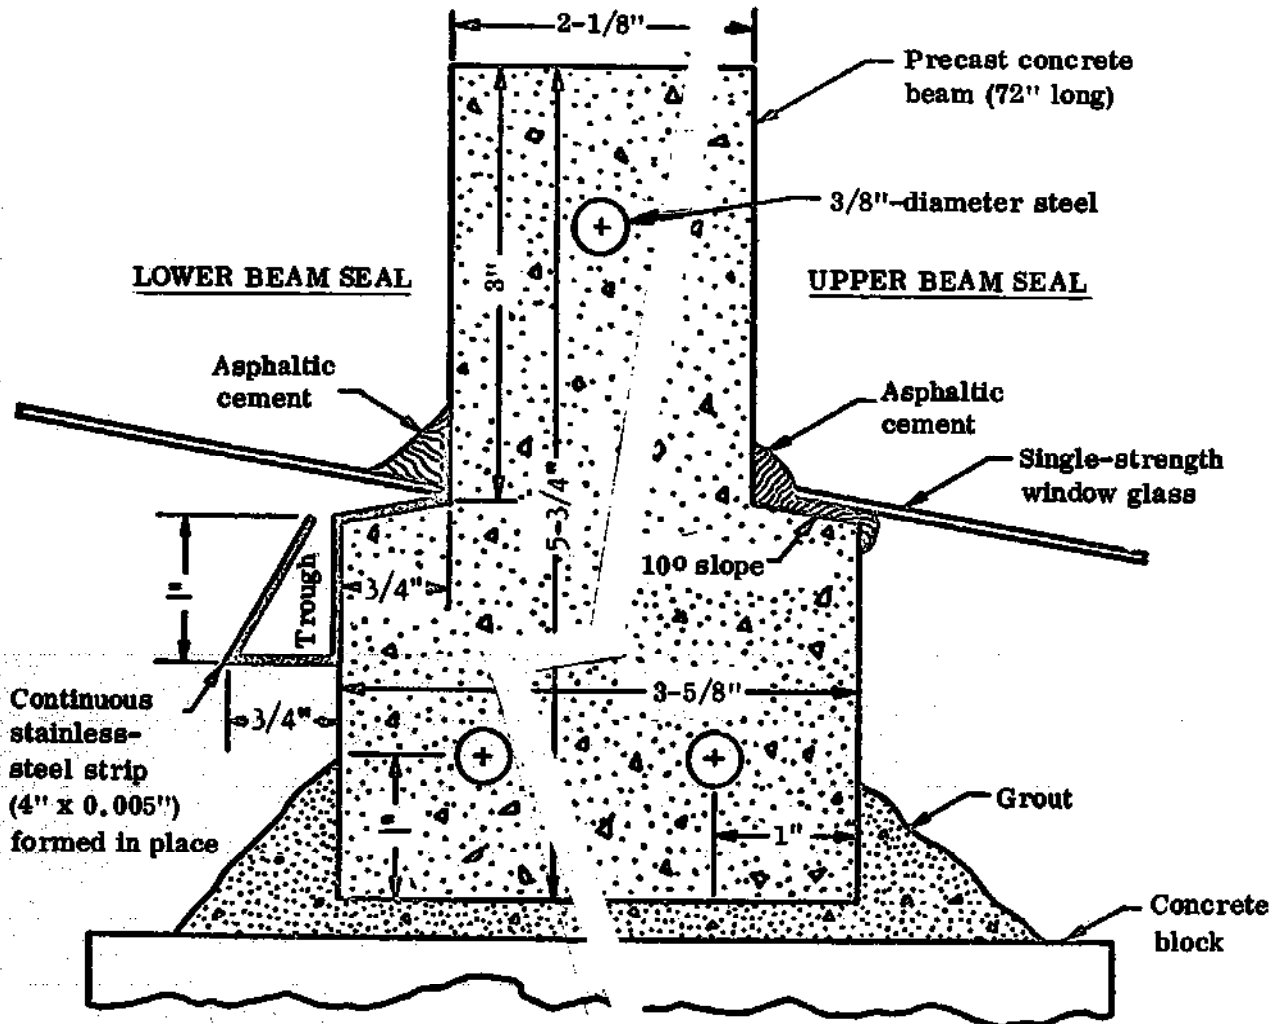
Plan and sections of basin-type solar still, Daytona Beach, United States of America
